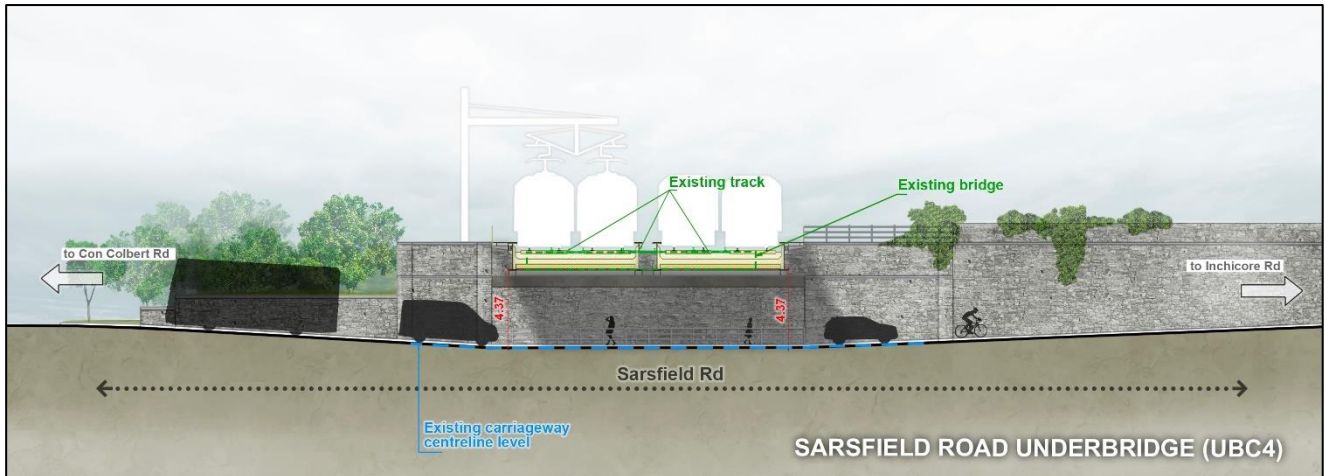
Emerging Preferred Option for Sarsfield Road Underbridge (UBC4)
